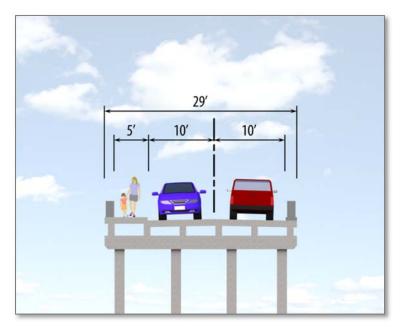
EXISTING BRIDGE TYPICAL SECTION
